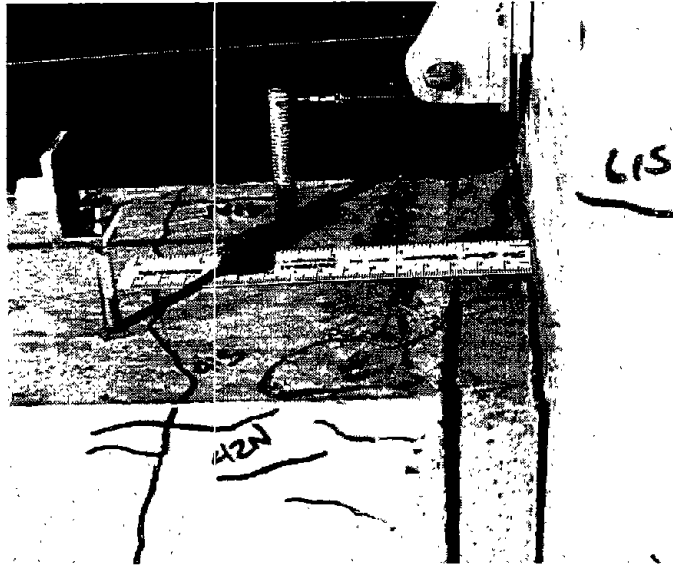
Opening between the beam and column at $6 \Delta_y$ - C-P-Z4.
